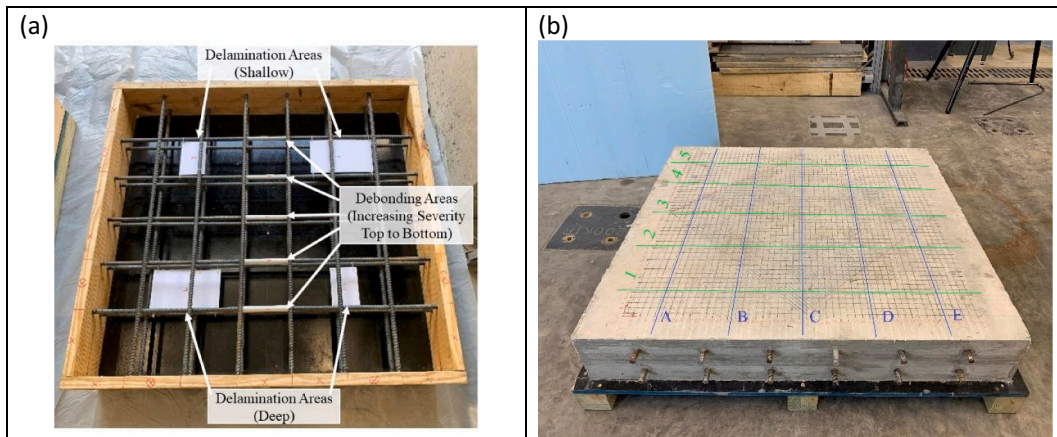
The concrete slab specimen: (a) formwork used for concrete slab casting, and (b) finished concrete slab.
